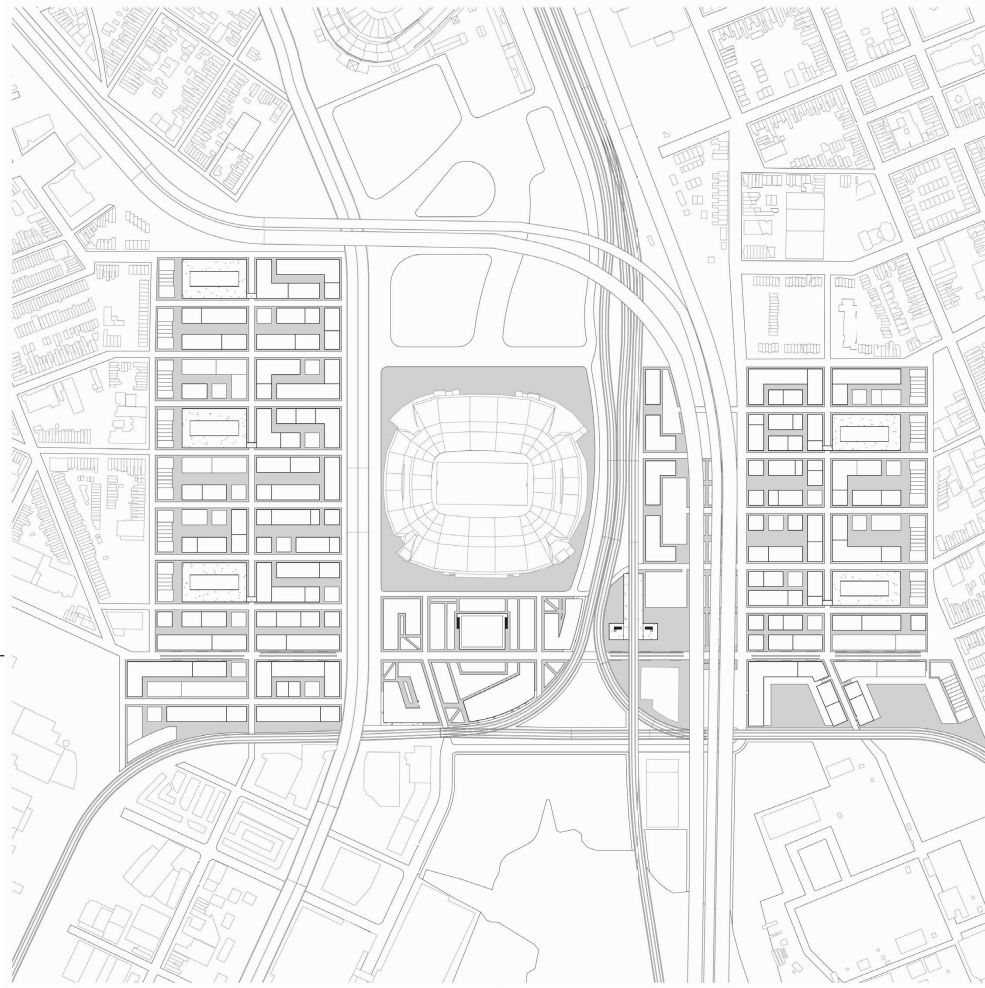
, Master Plan - Site Plan - New (Source: Drawn by Author)
